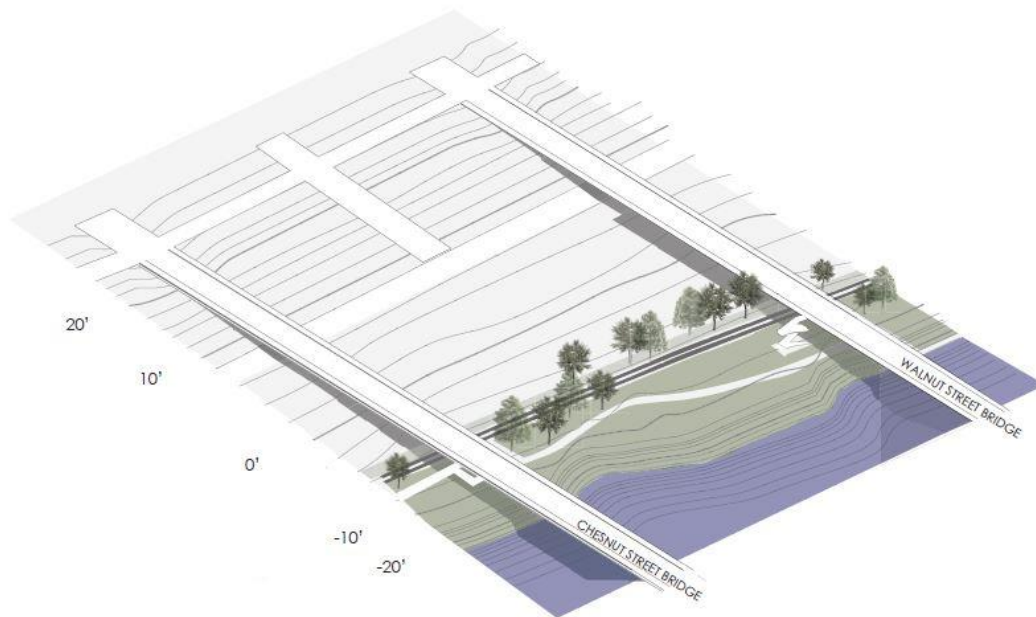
Site Axon Describing the Topography and Bridge Condition, source: author
